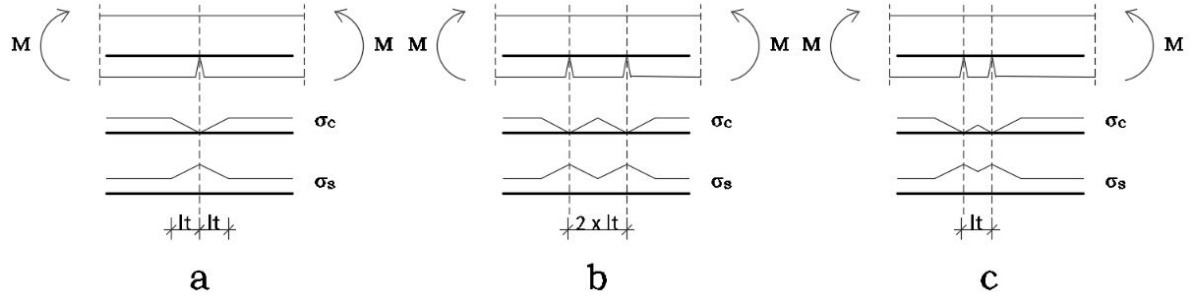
Stresses in concrete and reinforcement at the location of a crack.
